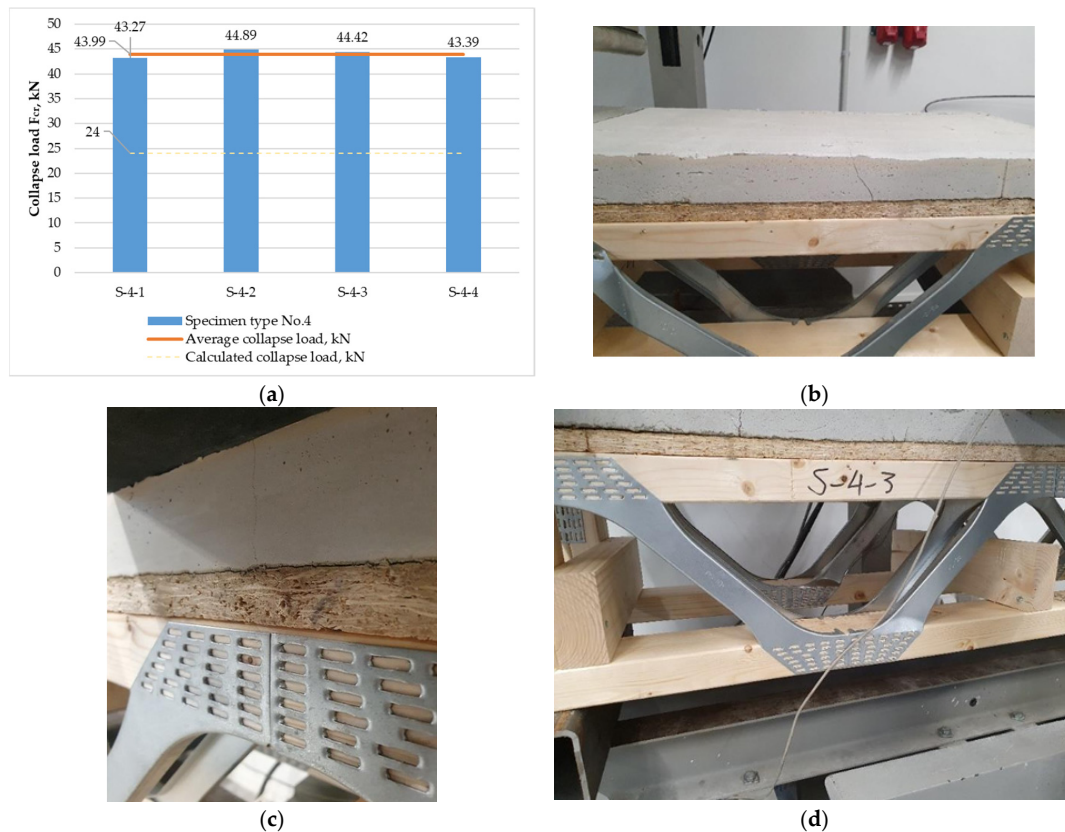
Load-carrying capacities of the laboratory specimens: (a) and its failure mode: cracks development in the concrete layer in the zone of the specimens support; (b,c) cracks development in the concrete layer in the middle of the span; (d) buckling of the compressed member of the lattice.
